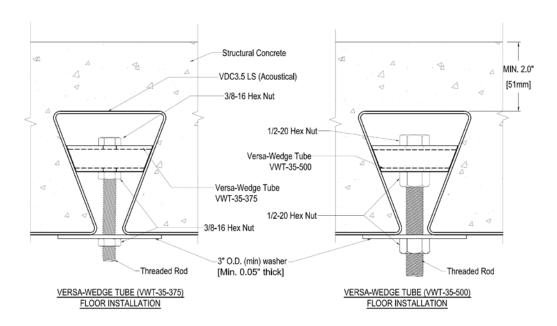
VWC AND VWT FLOOR INSTALLATION DETAILS Note: Hex bolts not shown.
